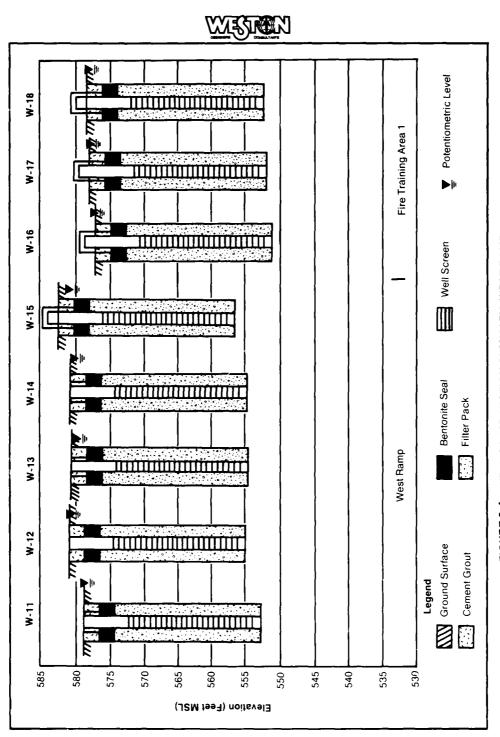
WELL CONSTRUCTION SUMMARY, WEST RAMP AND FIRE TRAINING AREA 1
